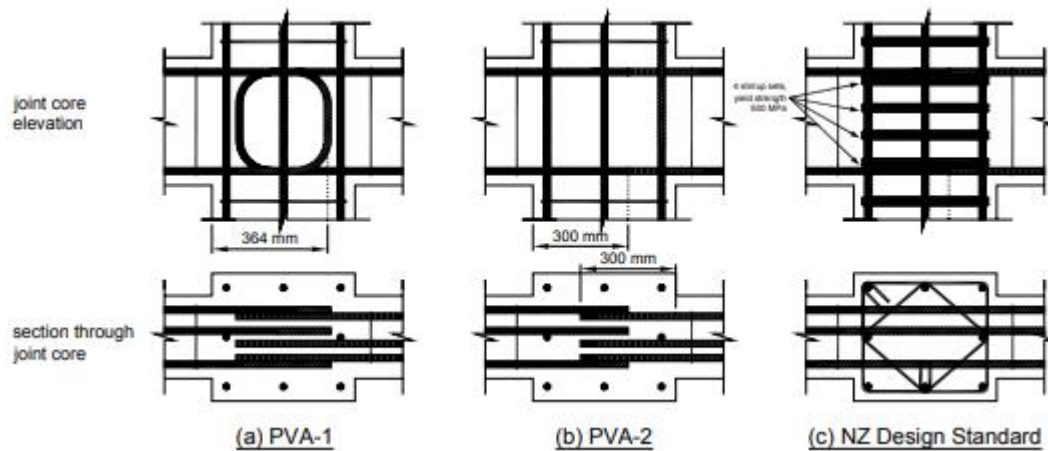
Joint core reinforcing details of PVA-1, PVA-2 and equivalent conventional joint
